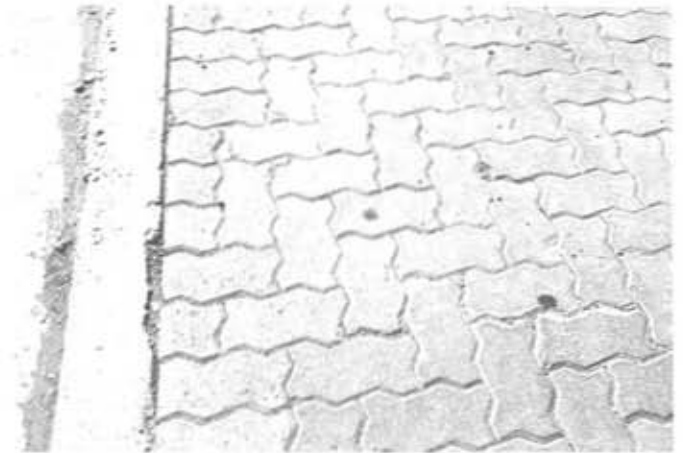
Interlocking pavers set on sand in a herringbone pattern and surrounded by a concrete edge.
